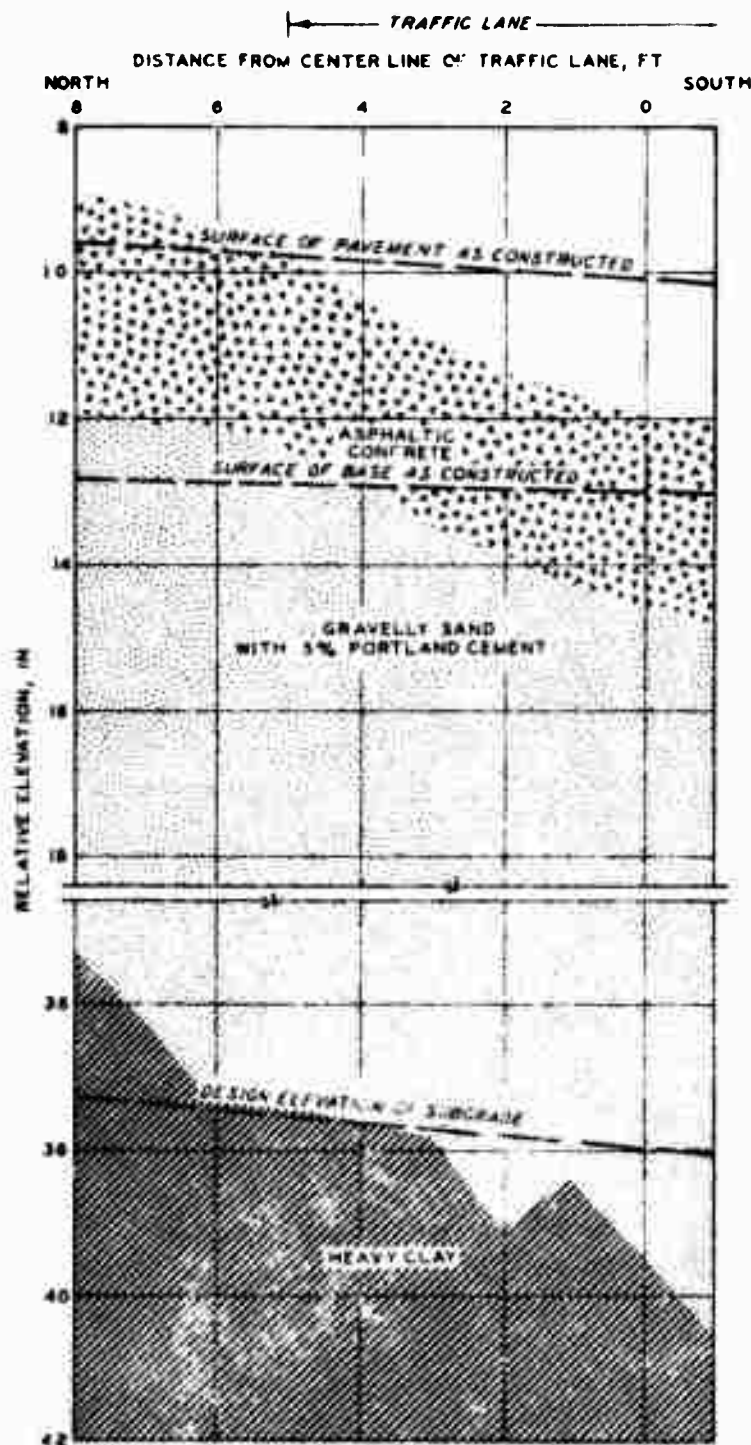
Test pit profile of item 3, lane 2, flexible pavement test section. Station 1+05 after 620 coverages of 240-kip twin-tandem assembly
